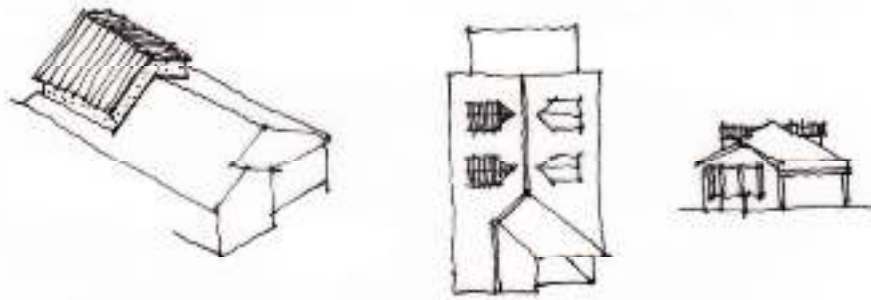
Roof extensions which provide additional space should be confined to the rear and not dominate the building form and streetscape while traditional dormers provide light and ventilation only.
